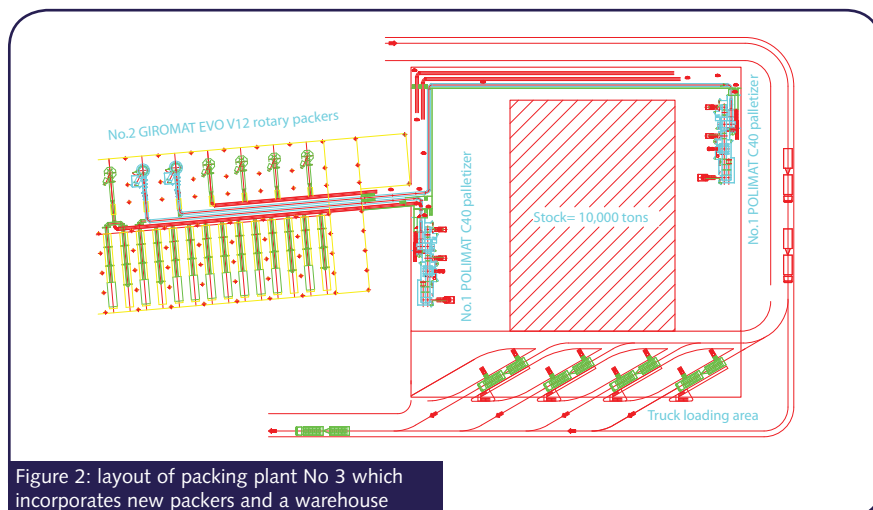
layout of packing plant No 3 which incorporates new packers and a warehouse
